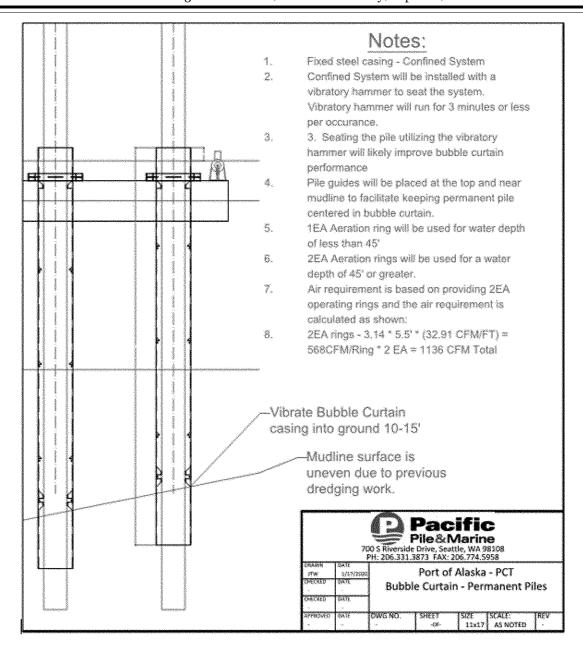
Diagram of pile and confinement system for the 48-in piles, showing arrangement requiring vibratory installation of confinement and separate advancement of pile.
